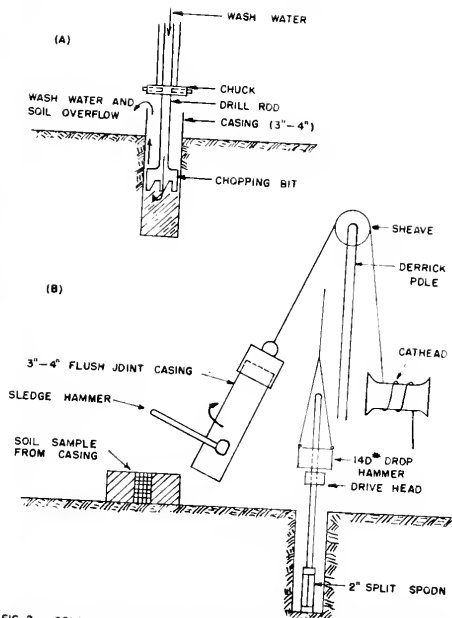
COMMON METHODS OF ADVANCING AND CLEANING BORE HOLES
